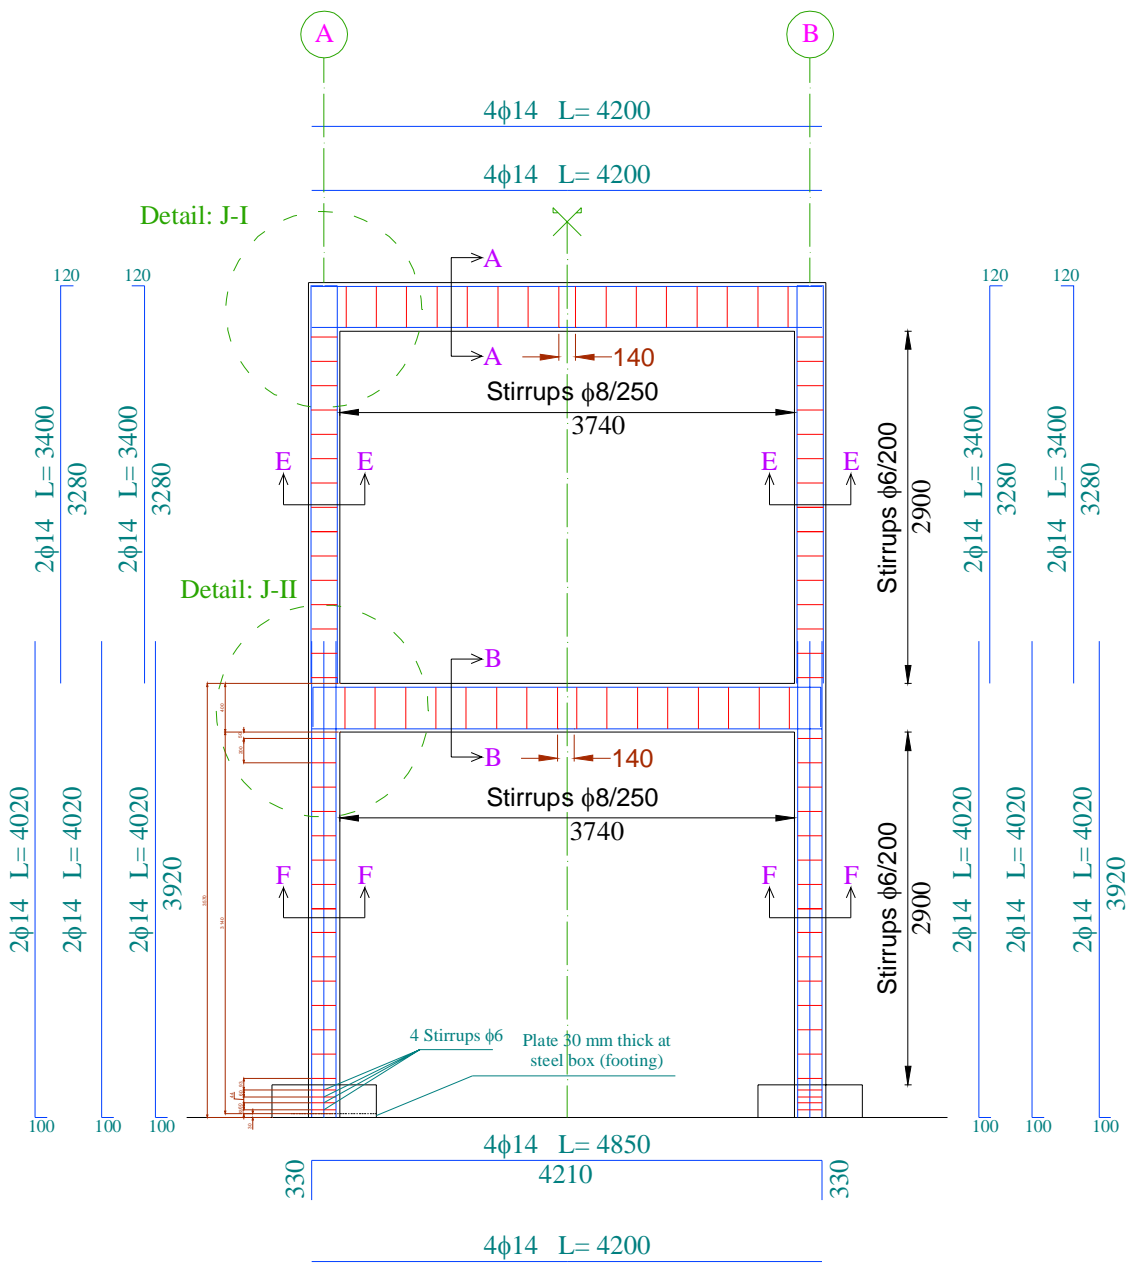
Frames 1 and 2- reinforcement of beams and columns
